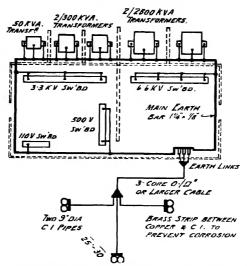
Typical earthing arrangements for mining surface sub-station.
